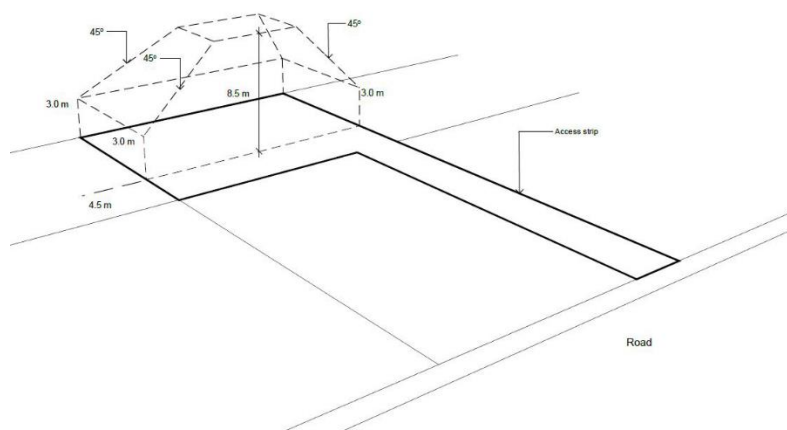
Building envelope for internal lots as required by clause 10.4.2 A3(a)
